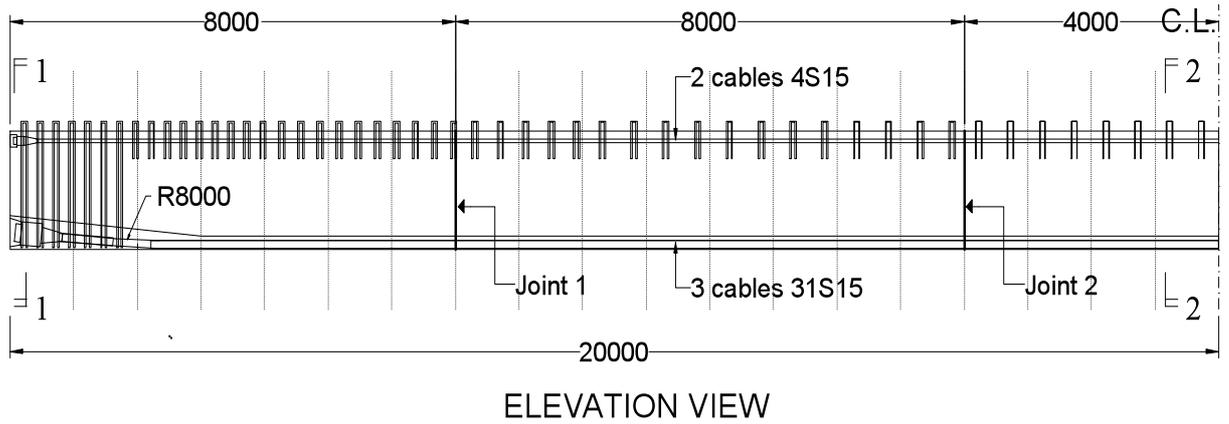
Dimension of DURA® - U1750-40 bridge girder.
